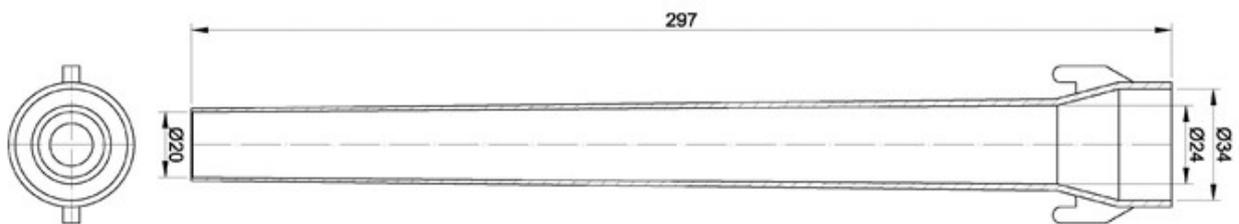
Anchorage type S 6-1 Standard - Bonded system
